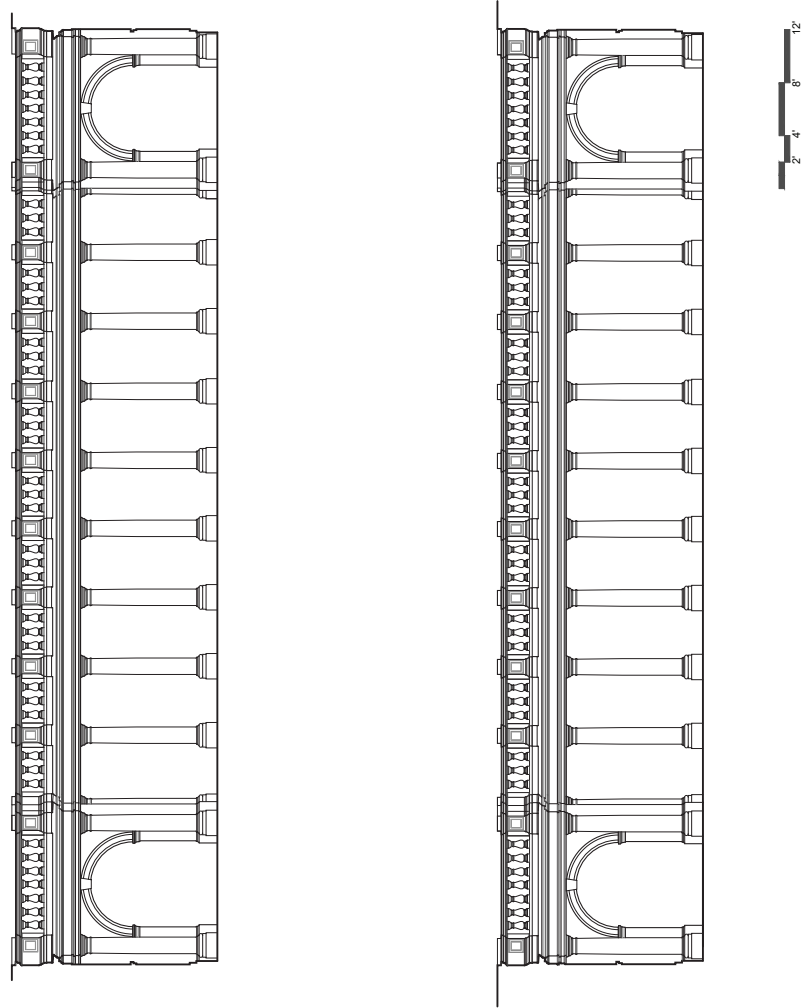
East elevation, east colonnade (top); and west elevation, west colonnade (bottom). Drawings by John G. Waite Associates, Architects, 2022.
